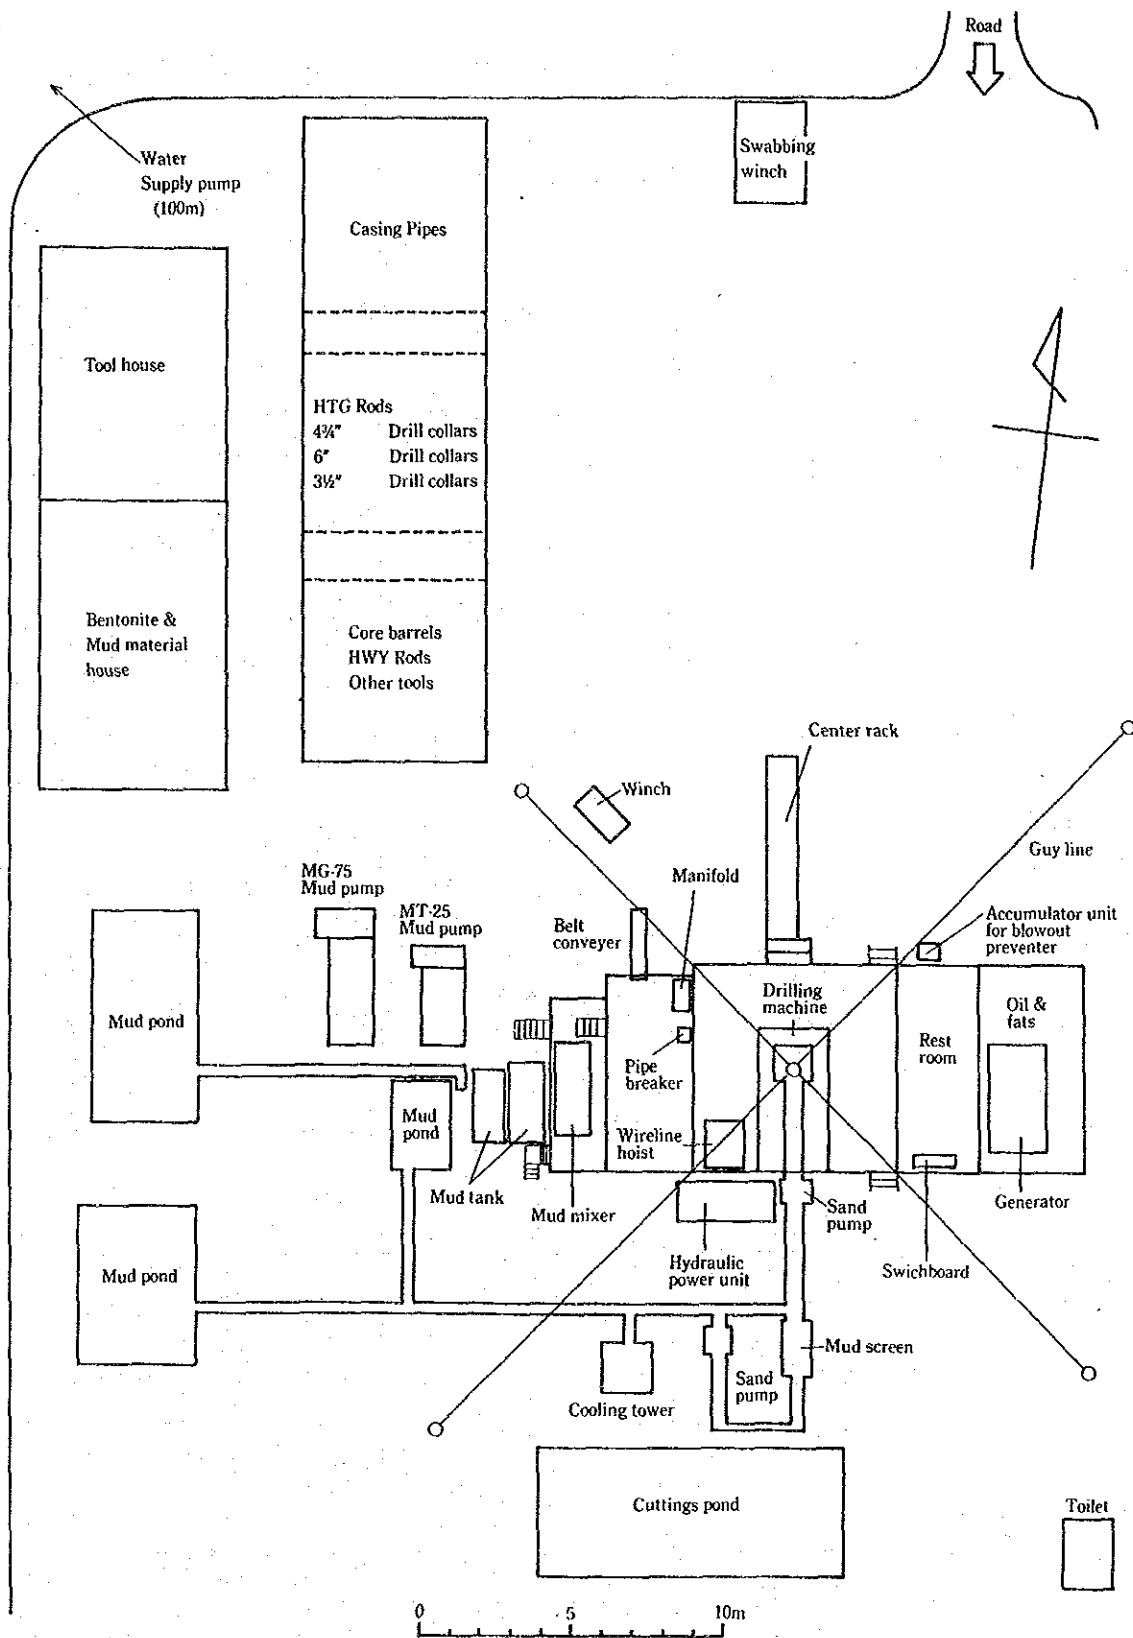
Lay out of Drilling Site of GTE-7
